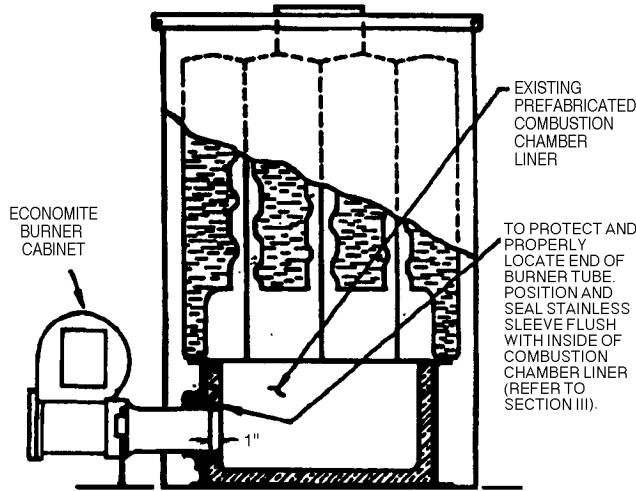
Dry Base Boiler with Combustion Chamber Liner (Warm Air Furnace Construction is Similar)
